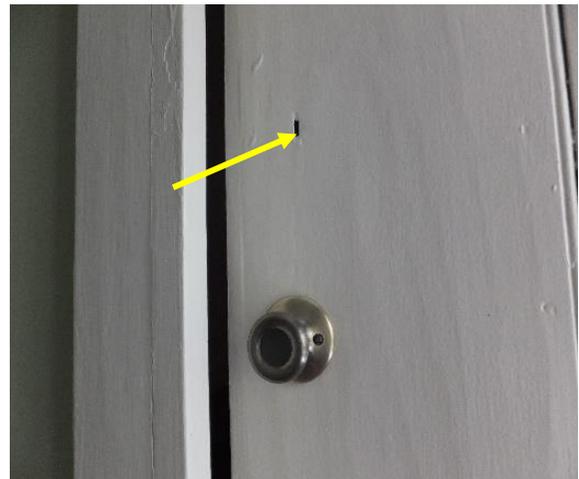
Contemporary pull knob installed at parlor stair door. Note key hole above.
